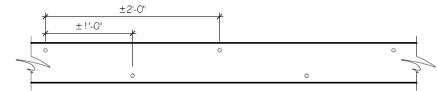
A - WOOD BLOCKING CORNER ANCHORAGE 8'-O" FROM CORNER
